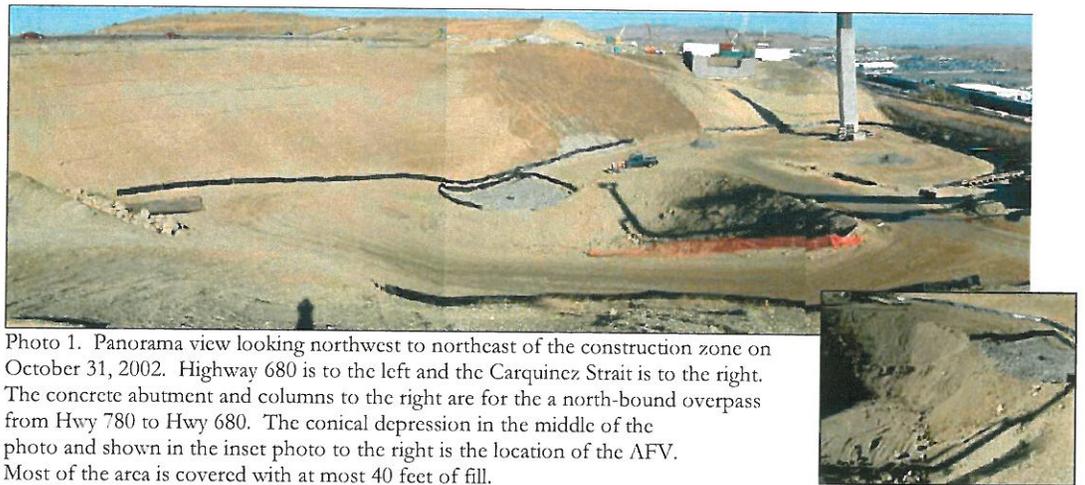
Panorama view looking northwest to northeast of the construction zone on October 31, 2002. Highway 680 is to the left and the Carquinez Strait is to the right. The concrete abutment and columns to the right are for the a north-bound overpass from Hwy 780 to Hwy 680. The conical depression in the middle of the photo and shown in the inset photo to the right is the location of the AFV. Most of the area is covered with at most 40 feet of fill.
